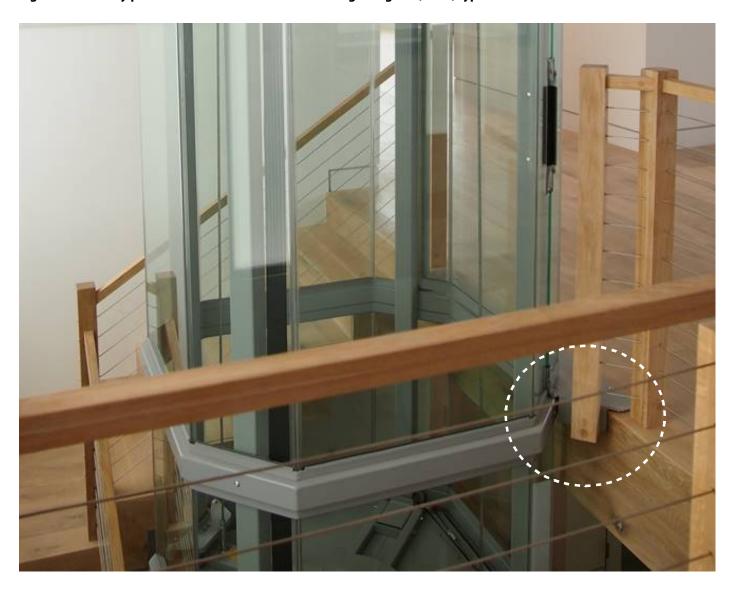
Balcony plate and handrail information - octagonal glass (OGM) type 1 shown
